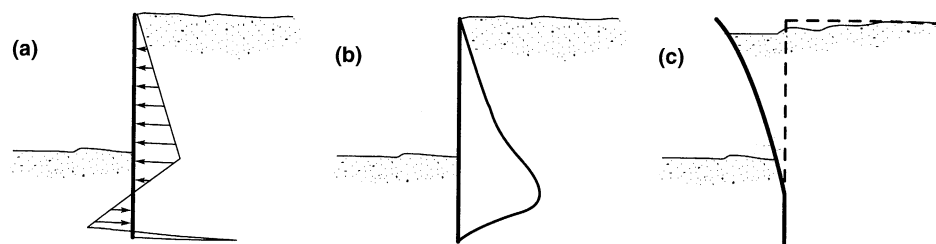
(a) Soil pressures, (b) bending moments, and (c) flexural failure mechanism for cantilever retaining wall.
